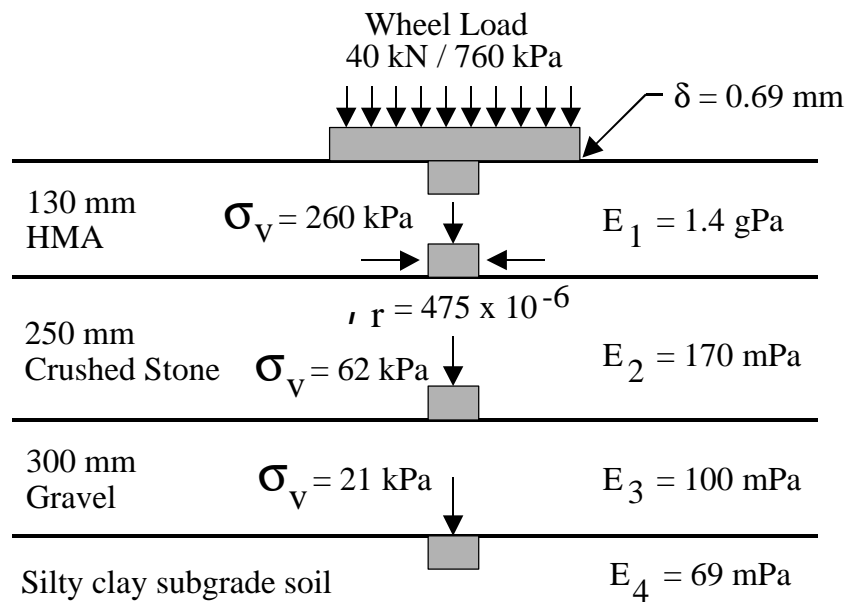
Typical tensile strain and compressive subgrade soil stress in “strong” pavement section.
